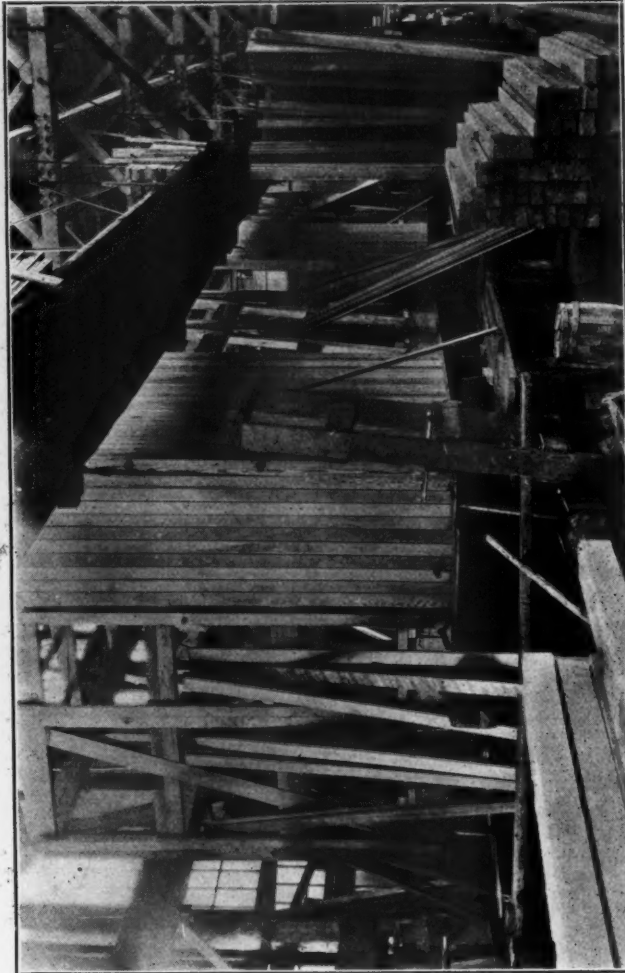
THE FIFTH STAGE—PUTTING ON THE SIDING.
